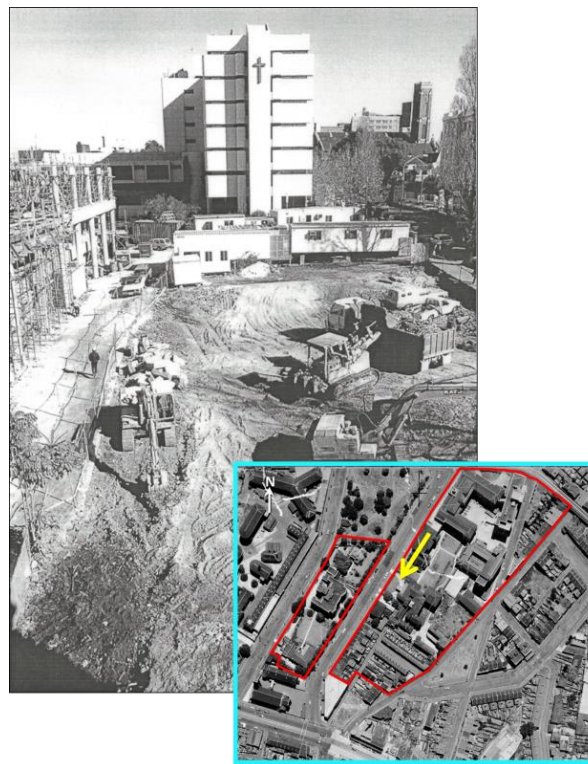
1988 - construction of the Aikenhead Building (left) and car park (inset shows location of photograph) (St Vincent's Hospital Archives).
